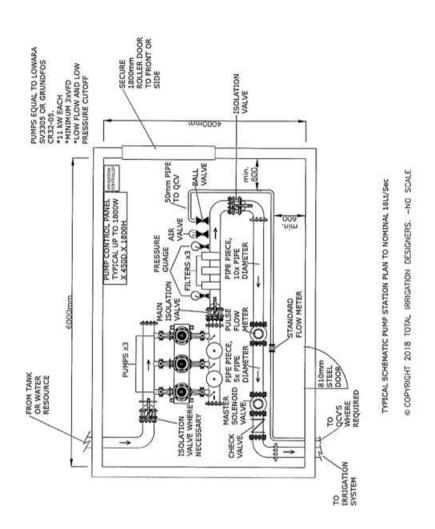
Pump Station Schematic Layout – flows between 9 to 18 Lt/sec
